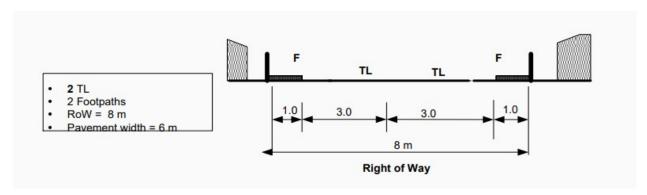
6 Typical Cross-section for Class B Roads (with RoW 8m)
